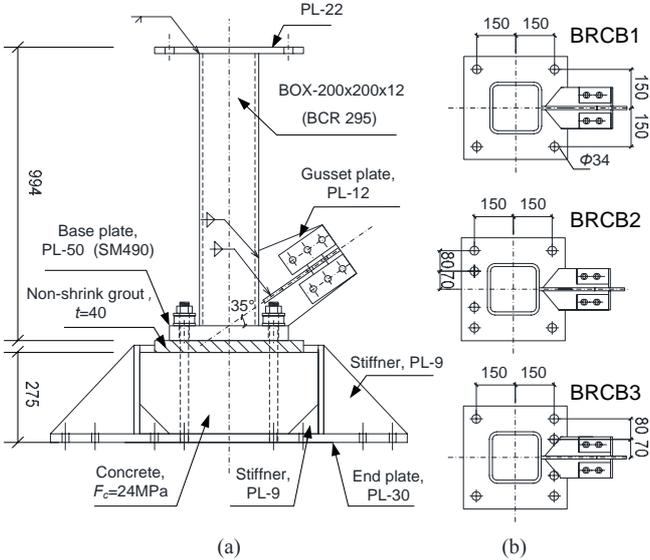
Test specimen: (a) front view; (b) anchor rods layout (unit: mm)
